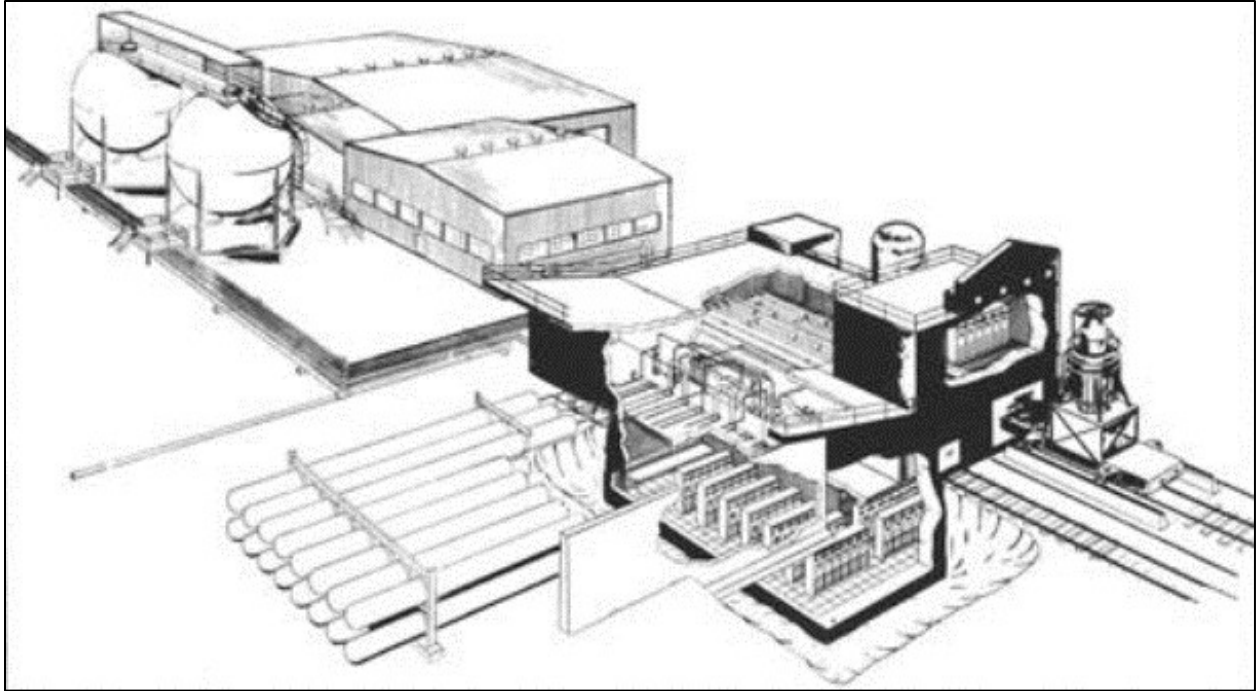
The initial (1960-1961) layout of the central structures of Test Cell C (detail from AW 1960e:89).
